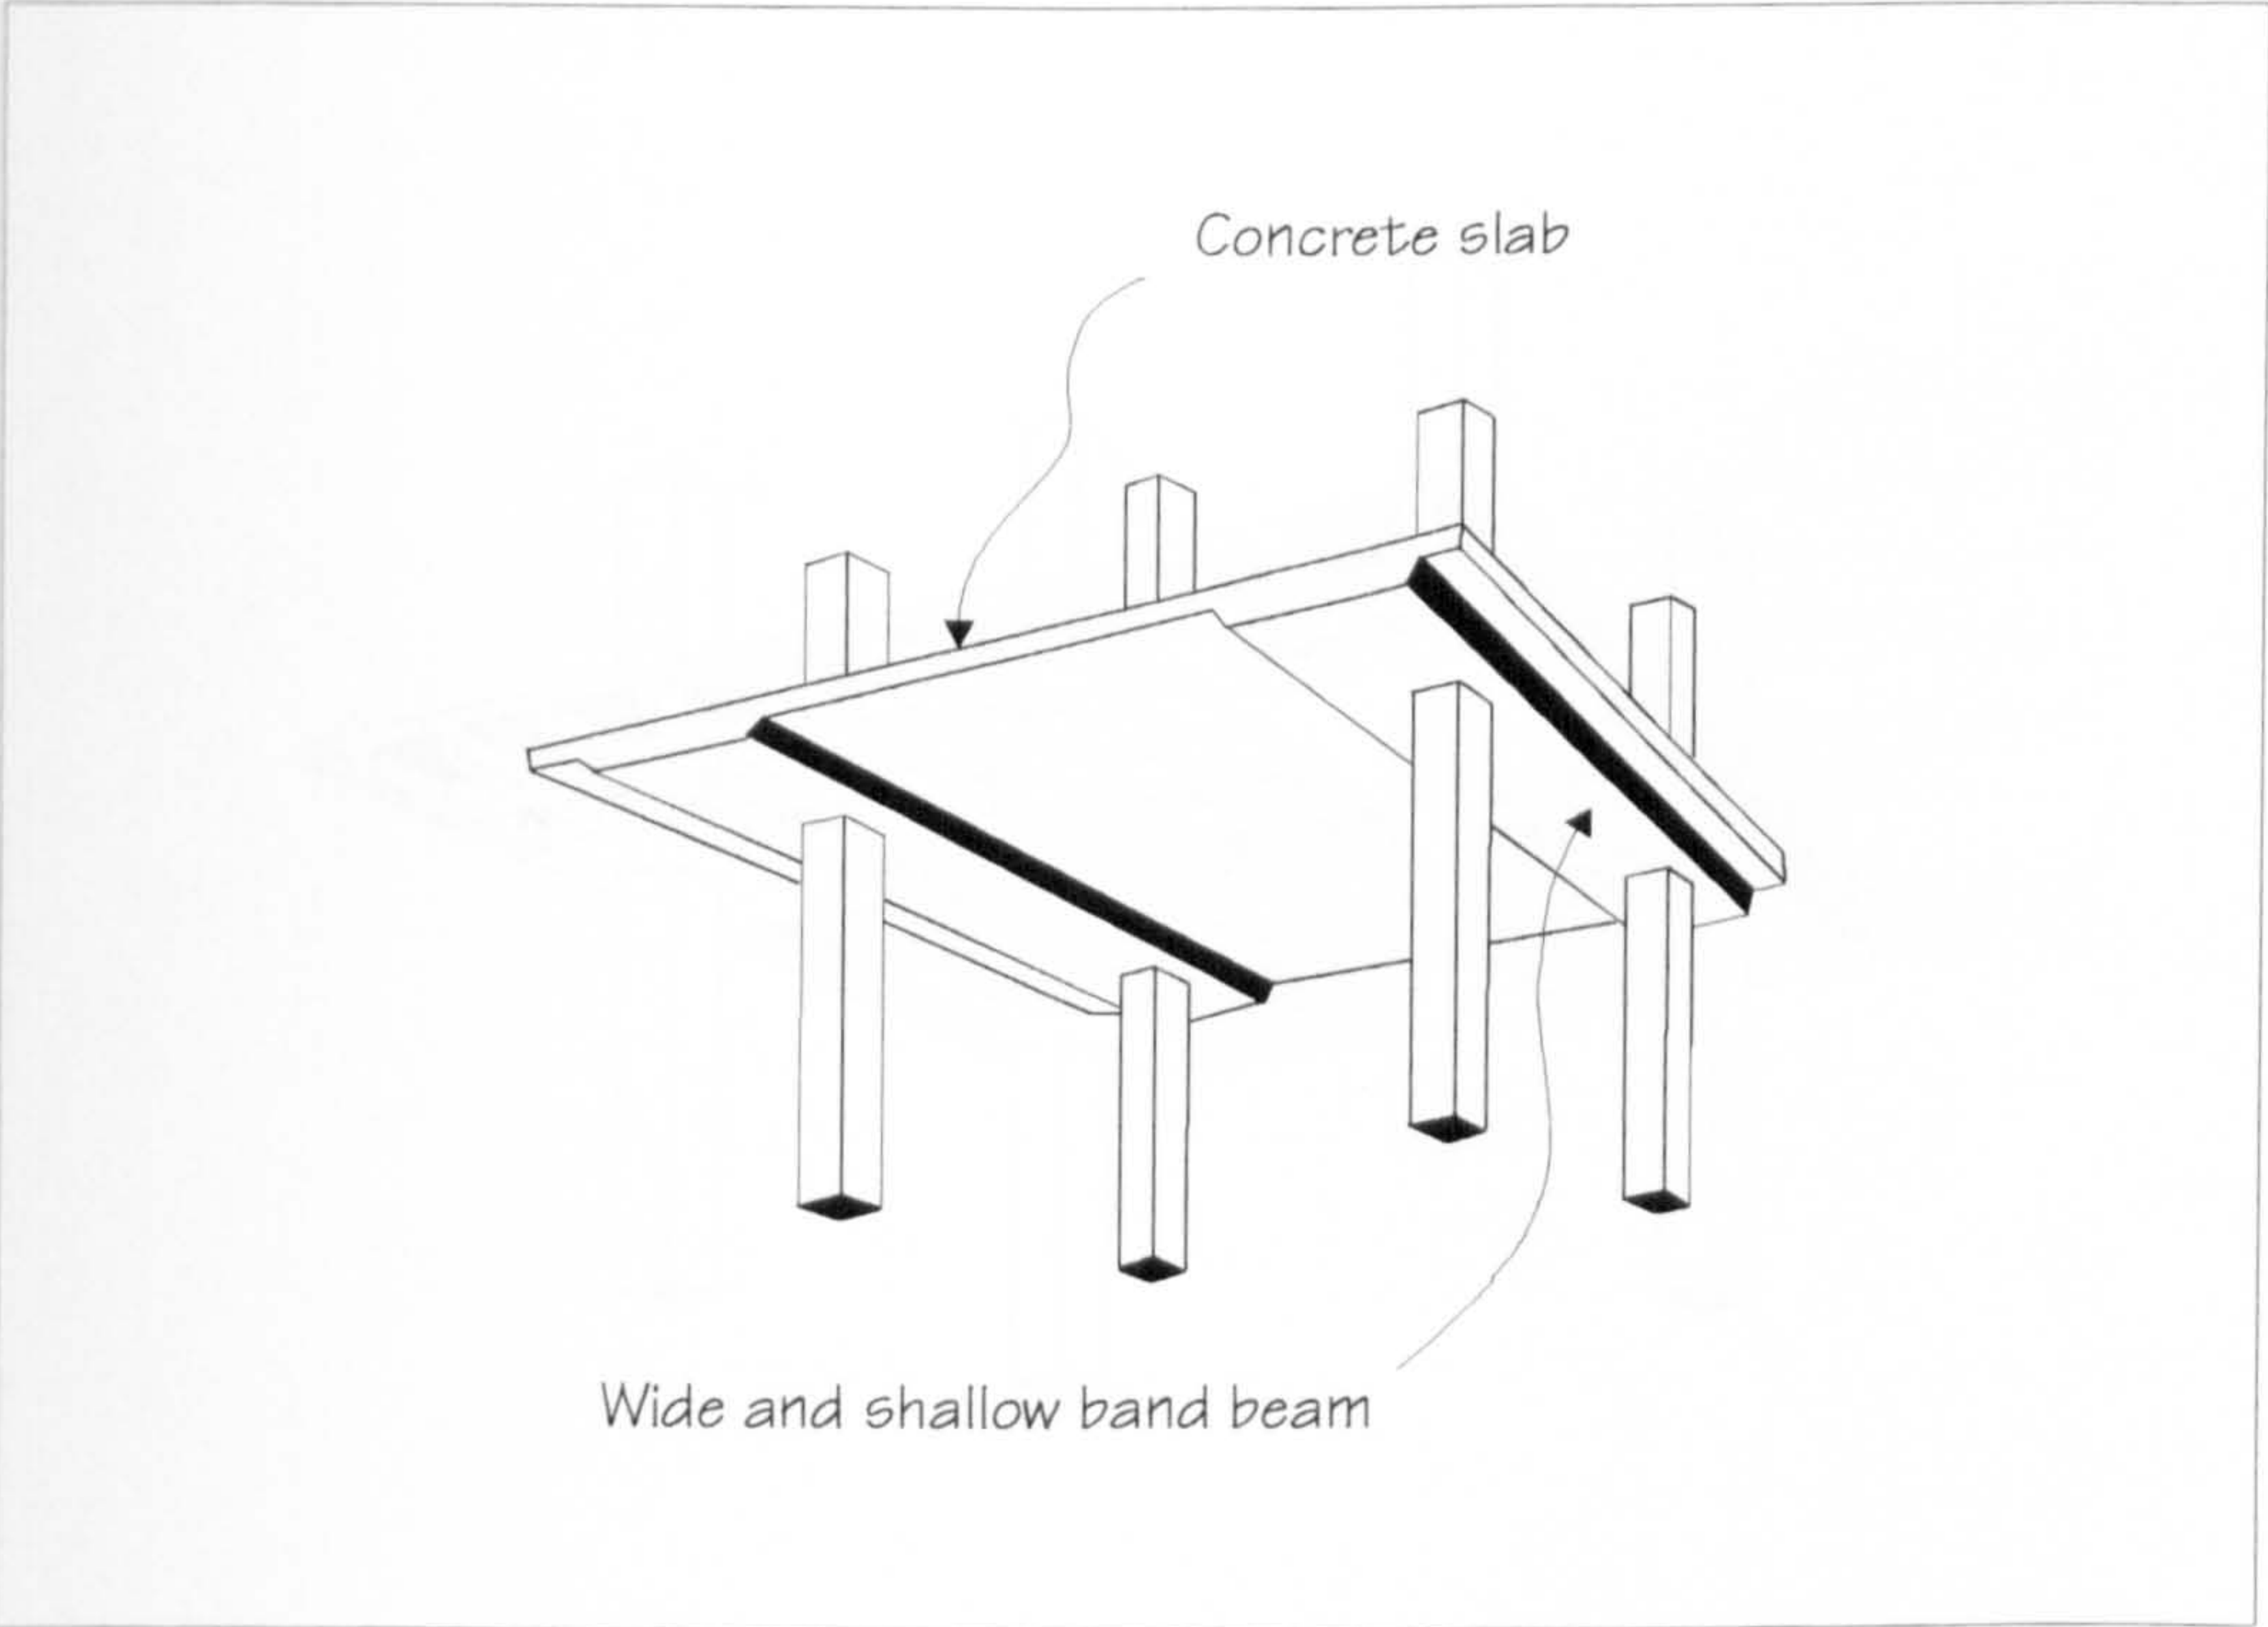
Banded beam and slab construction (after Stevenson, 1994).
